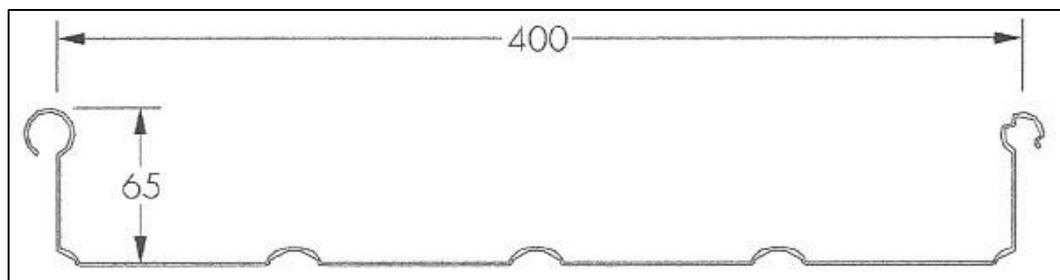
Common dimensions of standing seam sheet (BBA, 2007)
